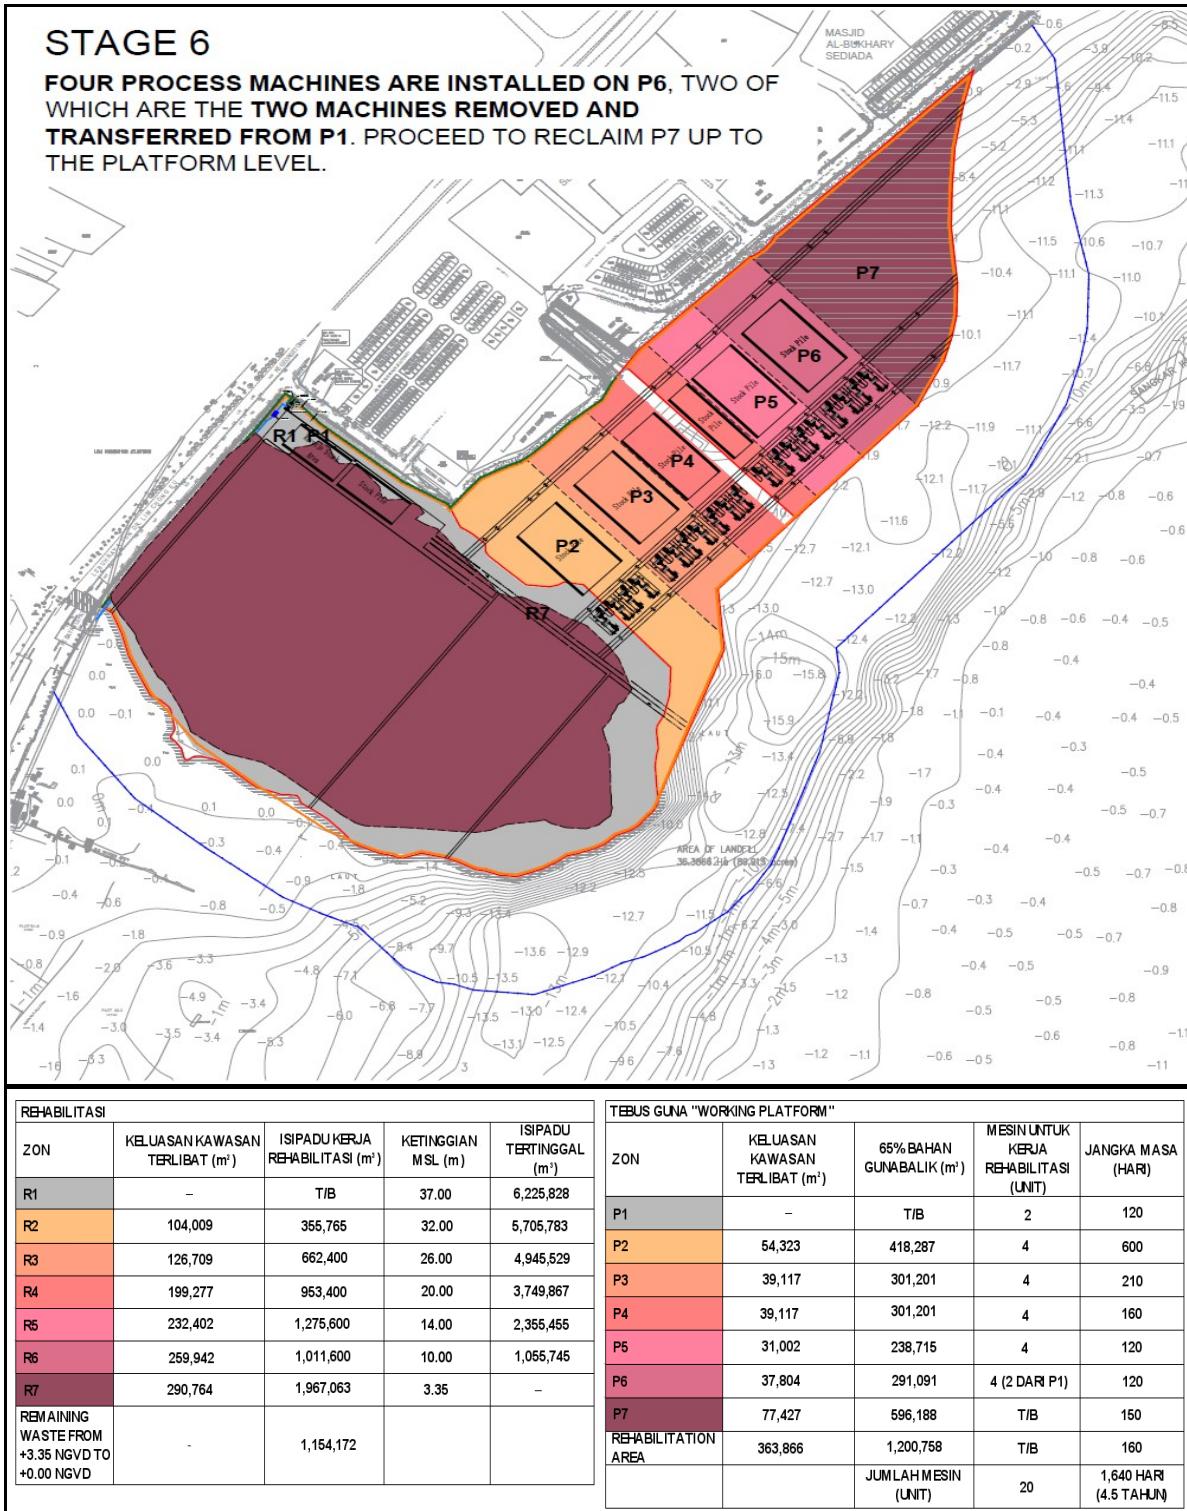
Layout Plan For Stage 6 Recycling Area On Jelutong Landfill
